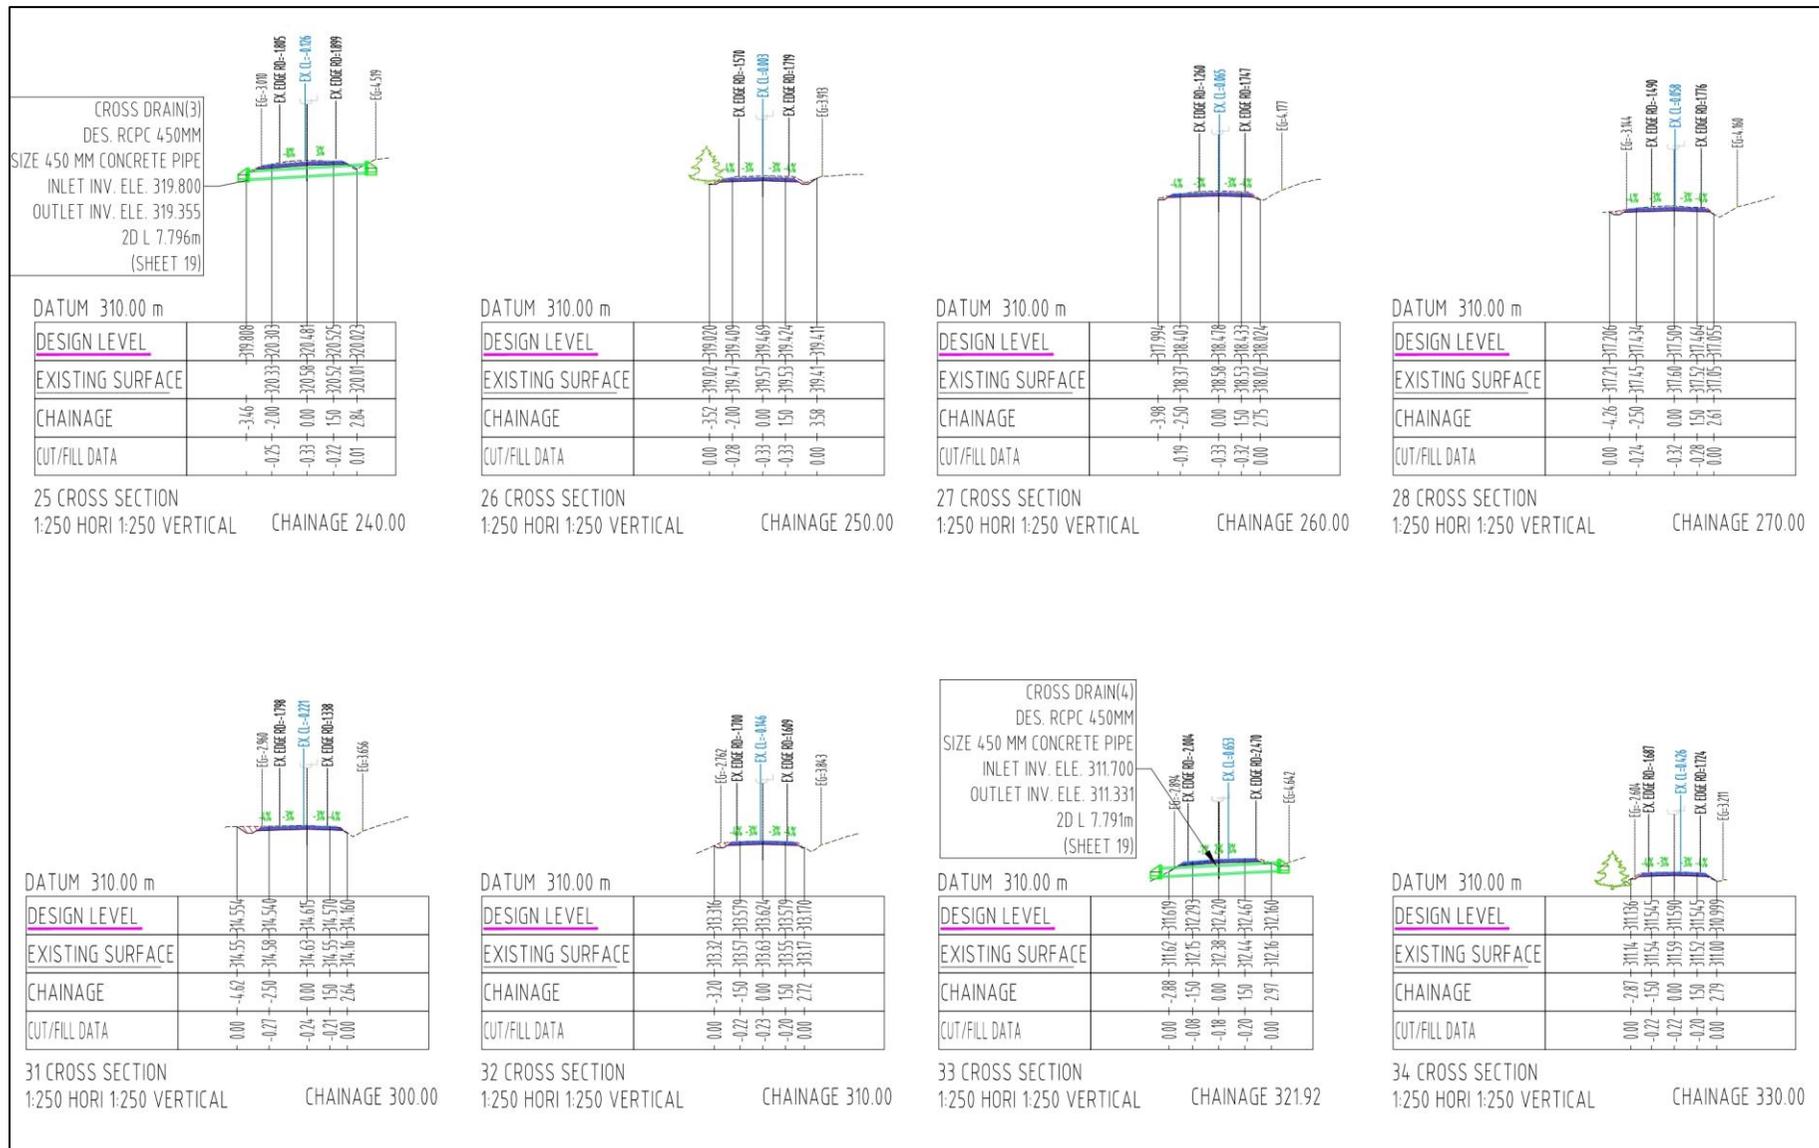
Map ID Section 1 (Main Road) typical cross-sections of proposed roadworks (Source: Water NSW, May 2025)
